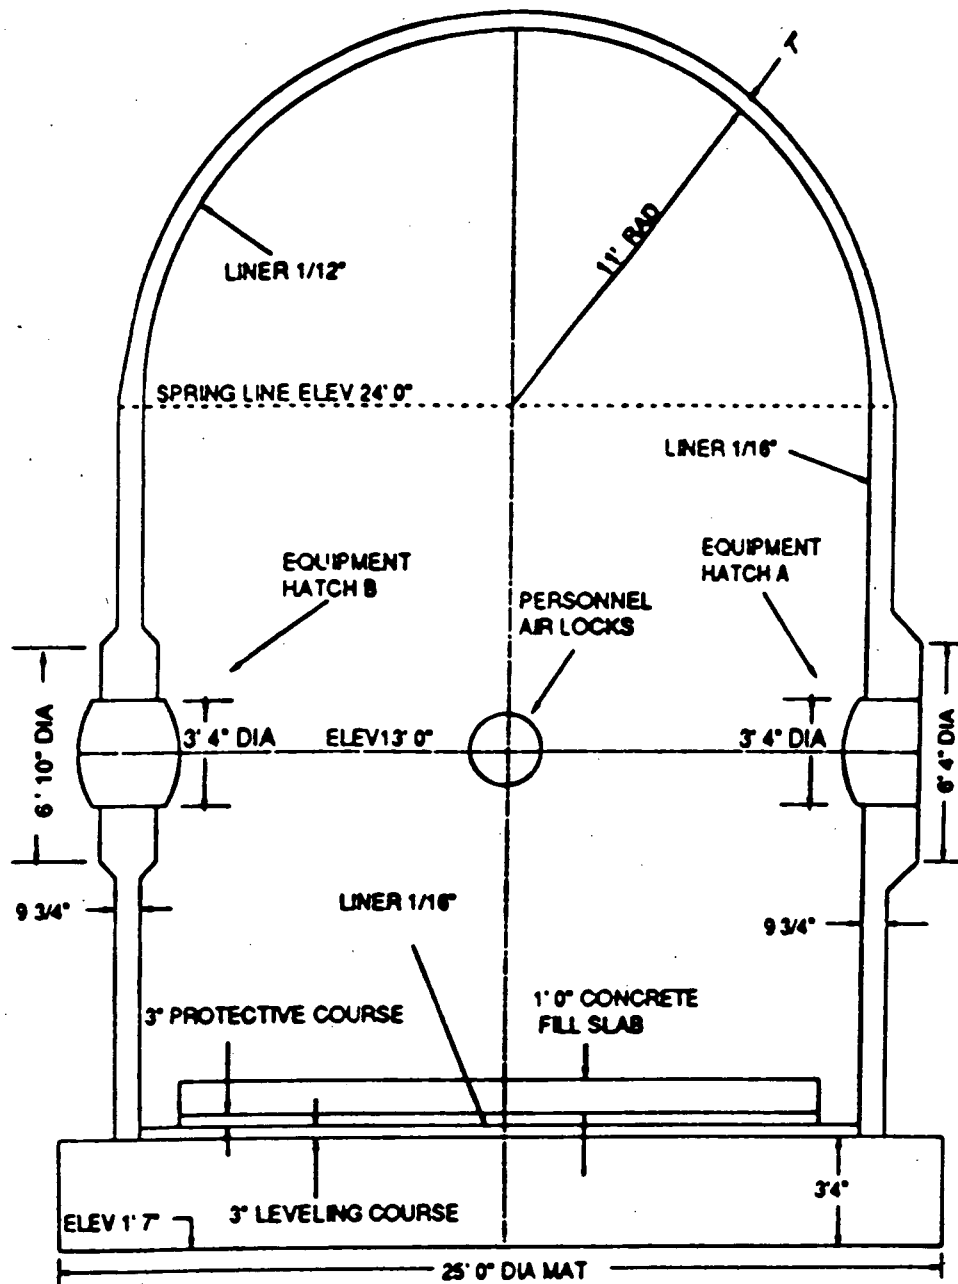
Sandia 1:6 scale reinforced concrete containment model.
